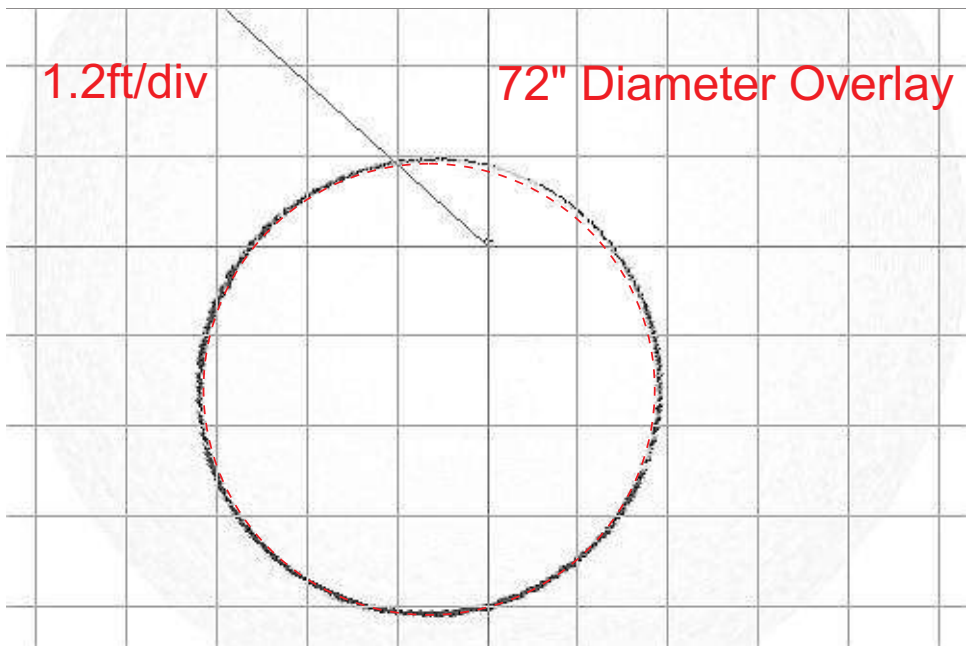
Sonar Profile 5 - 584 feet downstream of Access Point 1.
